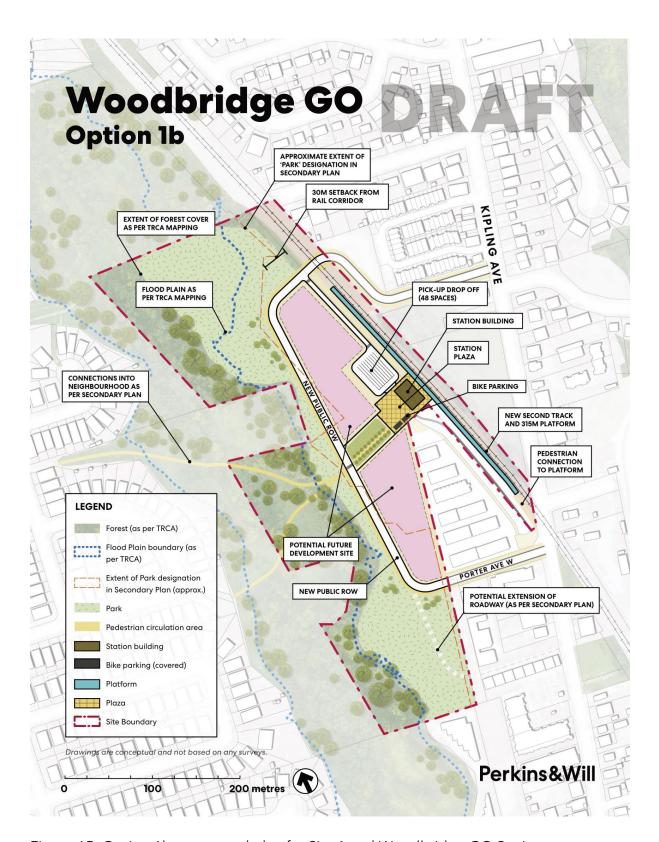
Option 1b conceptual plan for Site 1 and Woodbridge GO Station
